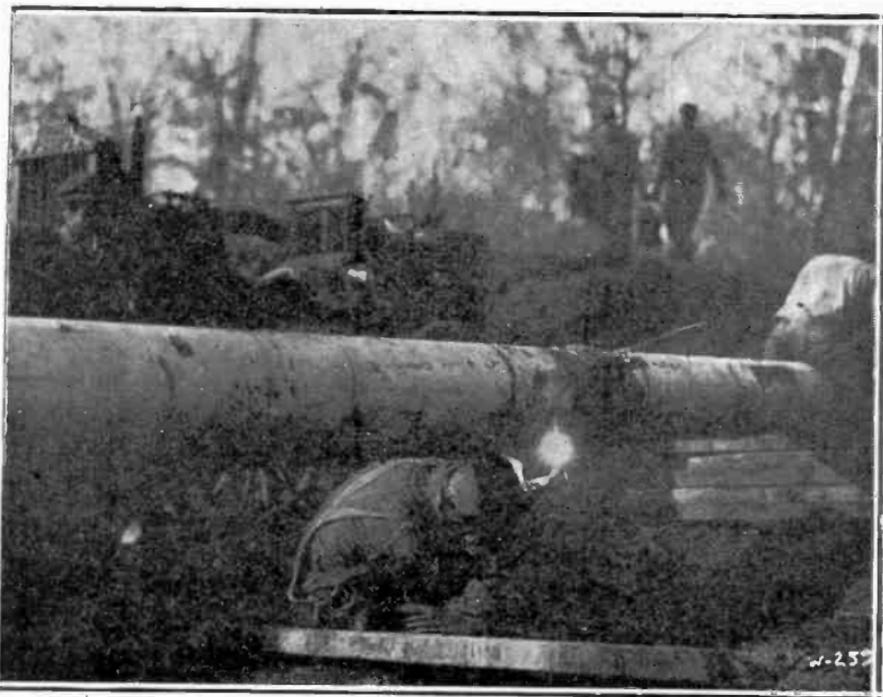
,175.—Operator welding overhead in making a bell hole joint. Photographed on Texas-Empire 600 mile line.
